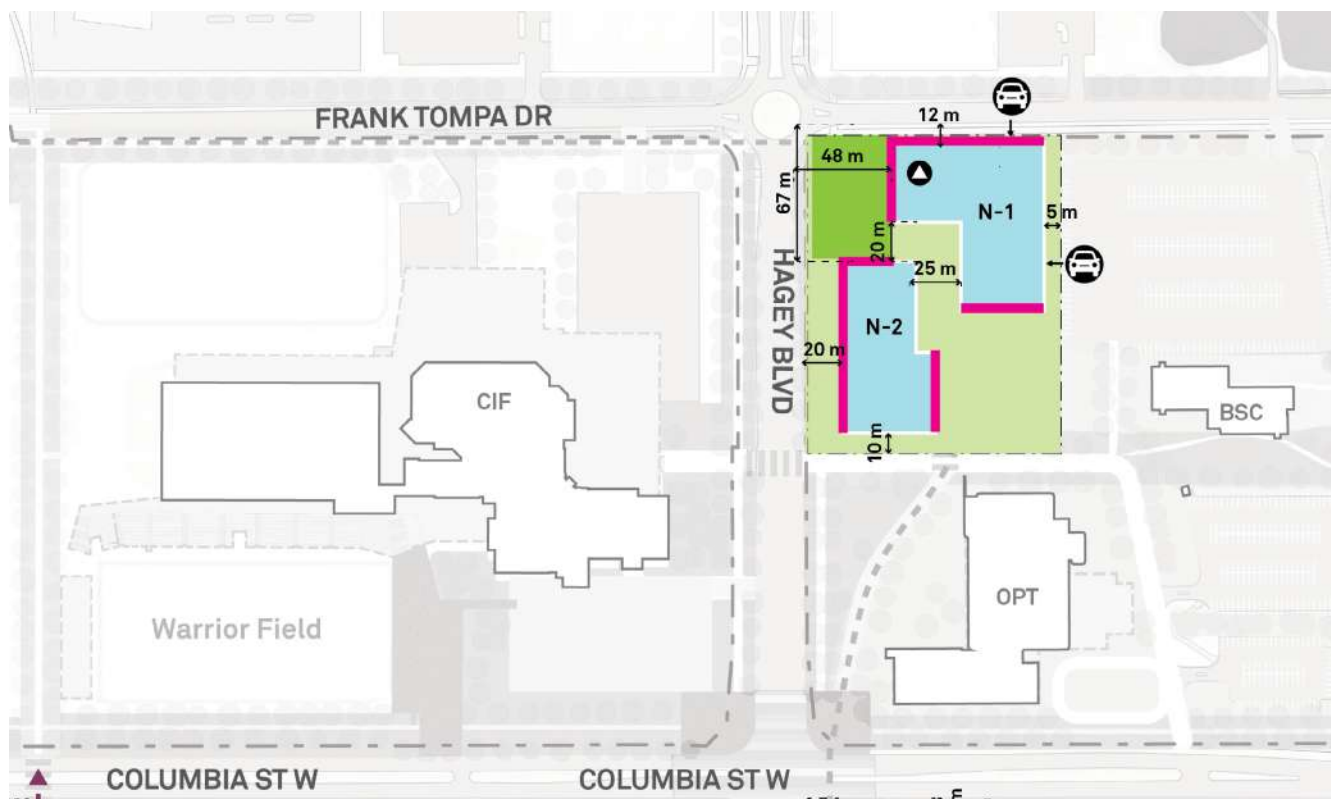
North Campus Site Opportunities Plan. Highlighting key site plan, setbacks, open space and building development opportunities
